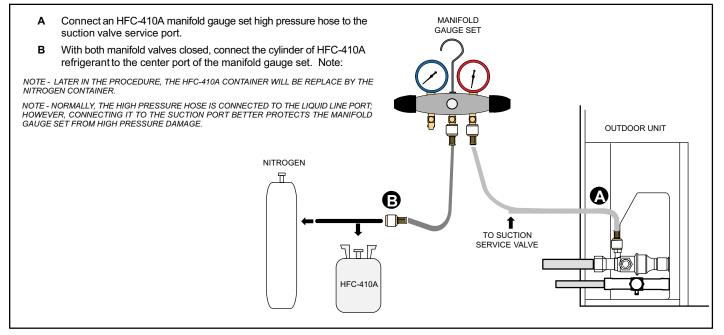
Typical Leak Testing Manifold Gauge Set Connections
